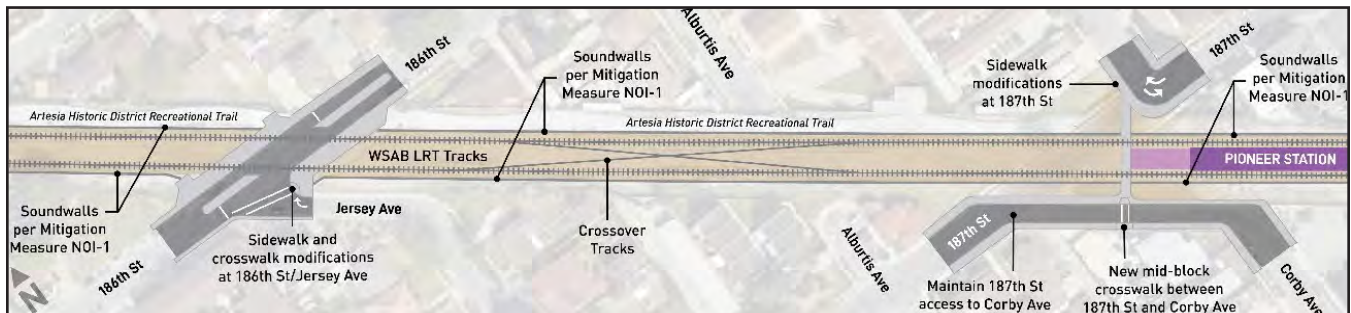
Pioneer Station - Proposed Access Alignments; Source: Cityworks Design and WSP
